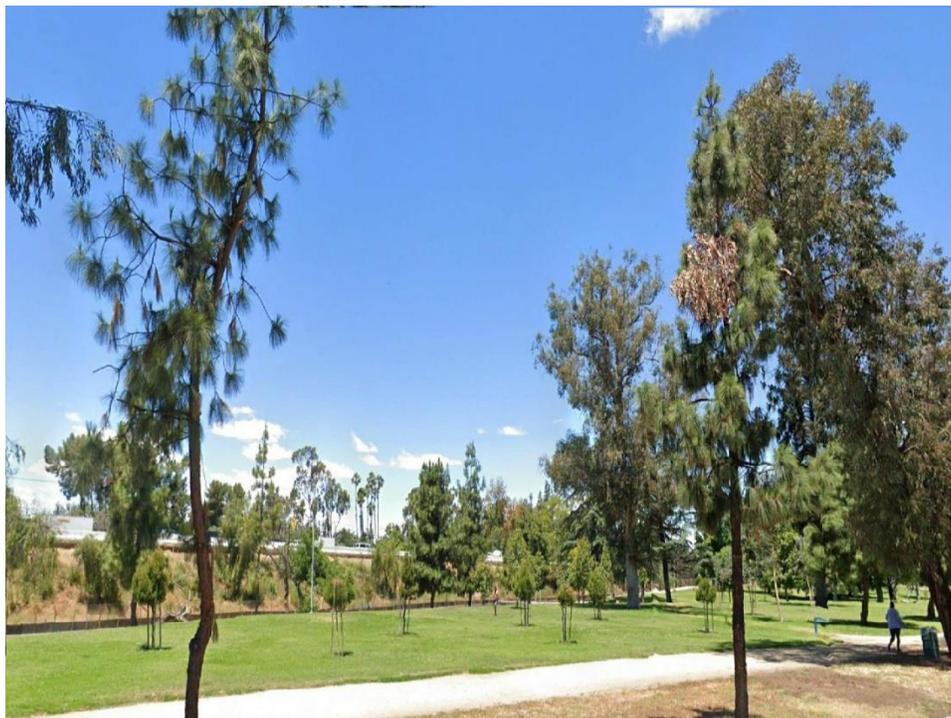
Facing northwest from Tujunga Avenue at manicured grass with native and non-native trees where underground infiltration gallery #7 is proposed for installation.
